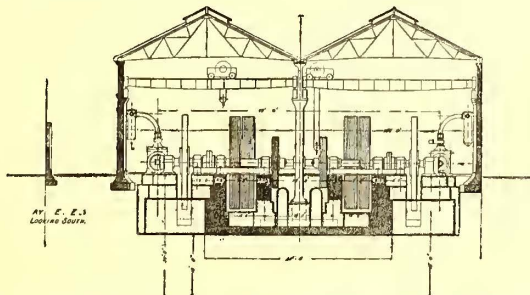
TRANSVERSE SECTION OF POWER STATION—GLASGOW CABLE RAILWAY.
